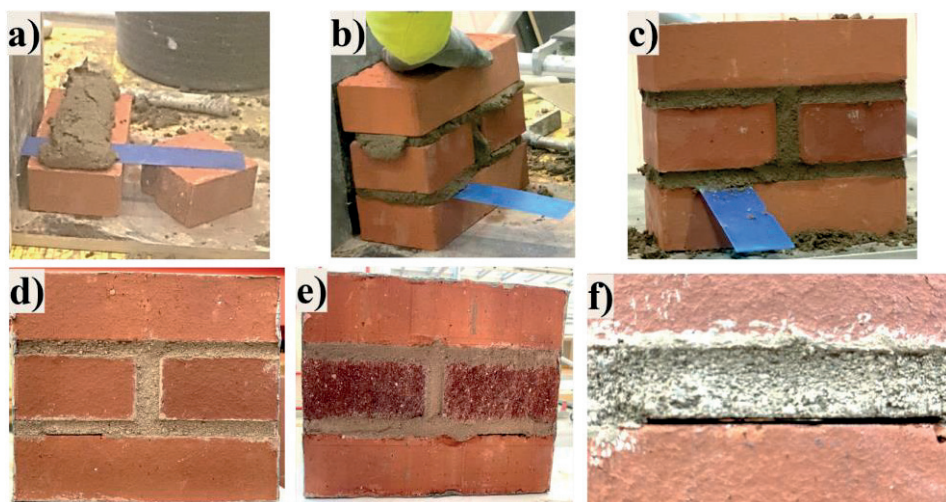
Preparation of specimens with an artificial crack: a) laying the first brick course and placing a plastic strip to create the crack, b) placing the third brick course, c) a 3-course masonry prism prior to removing the plastic strip, d & e) front view and backside, and f) close view of the artificial crack [135]
